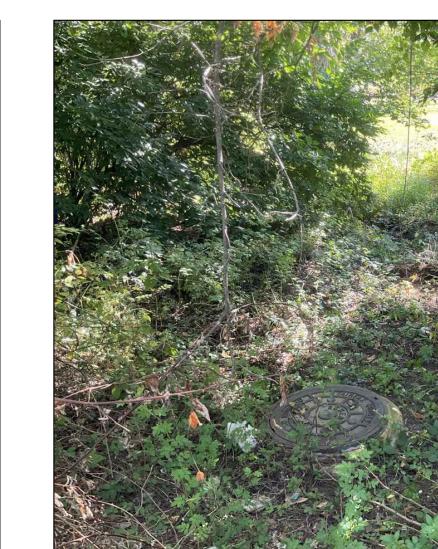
UNKNOWN STORMWATER OUTFALL PIPE
